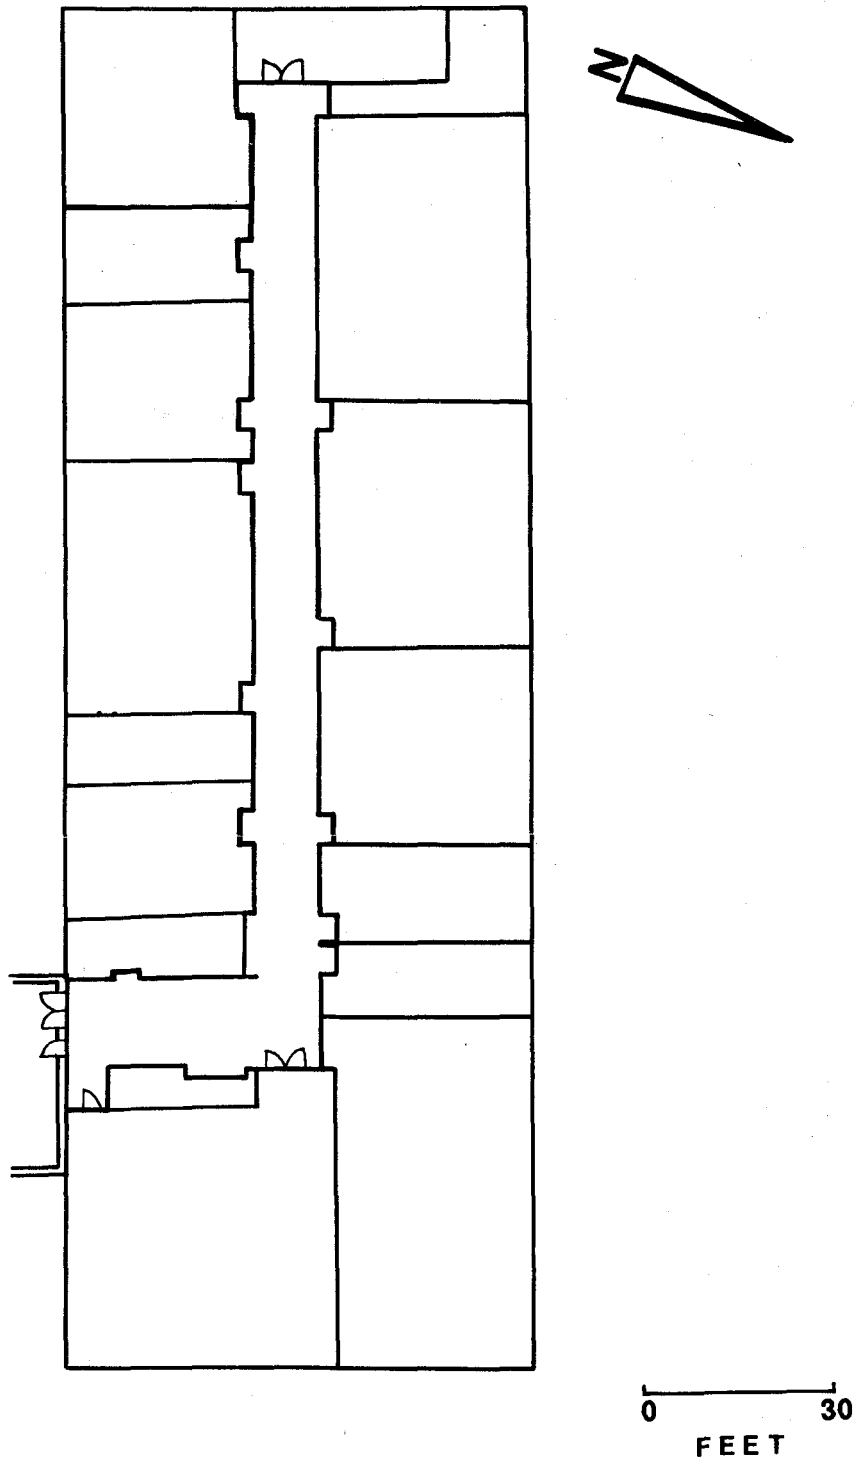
Preview Site - Scarfe Building, Third Floor, Classroom Block.
